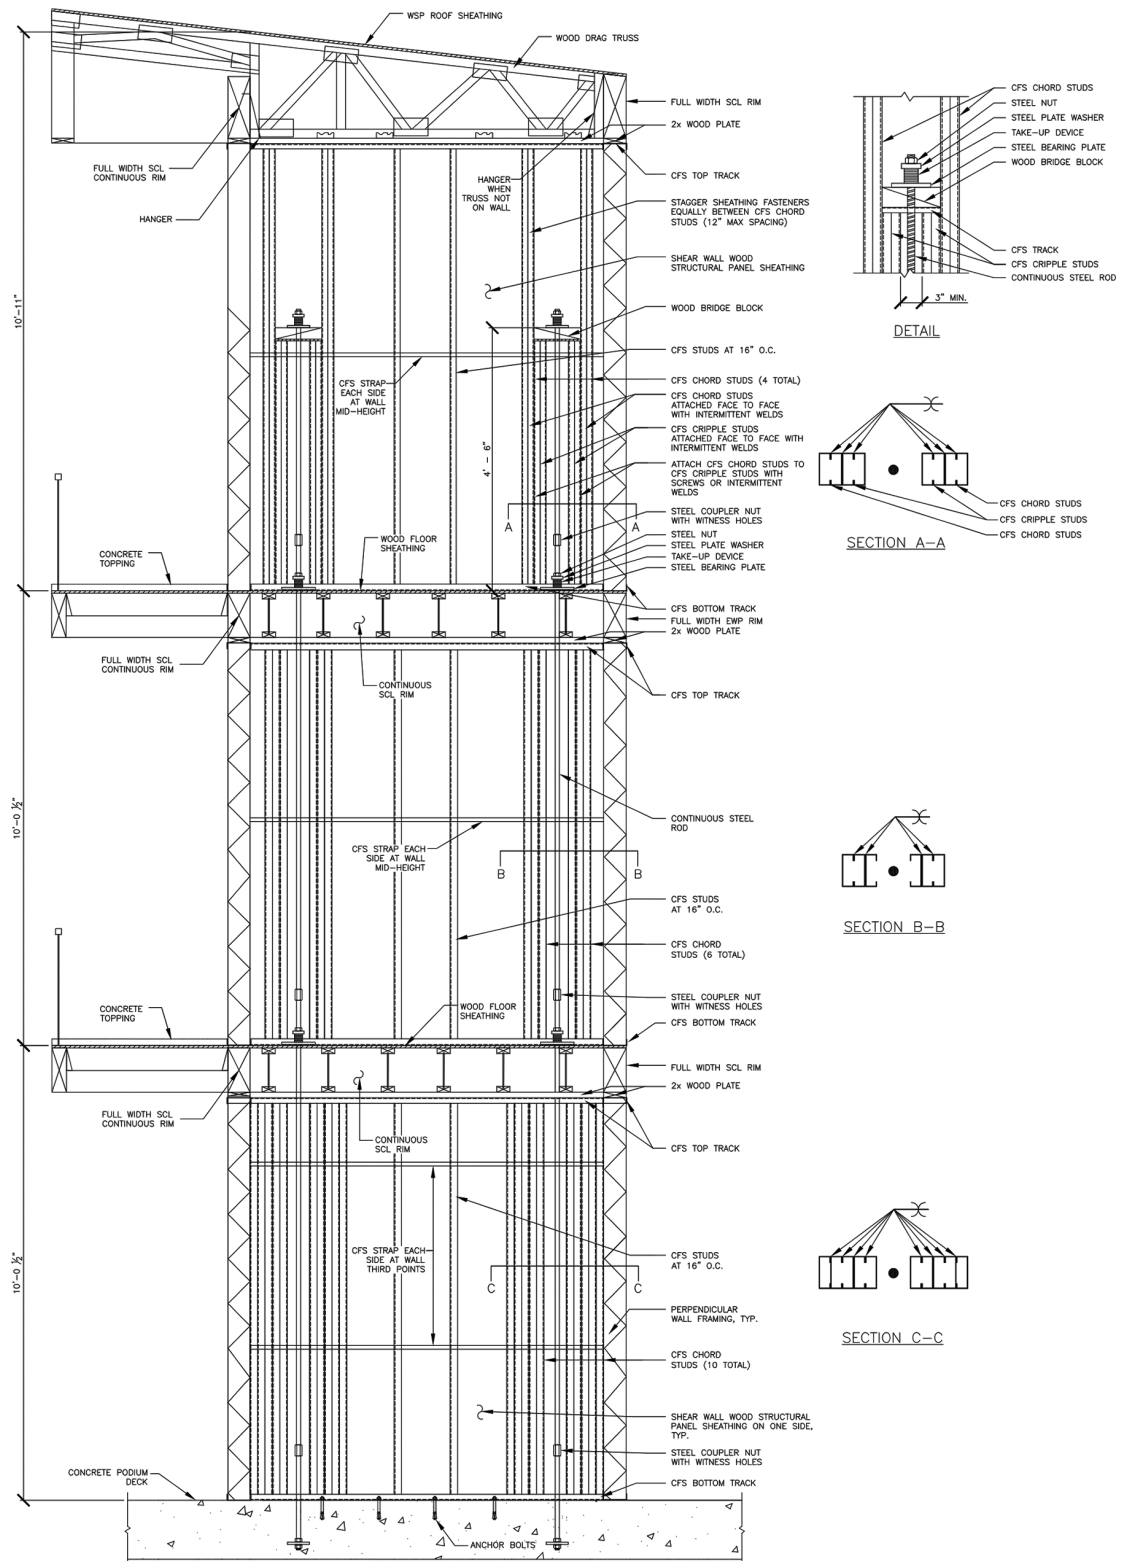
Shear wall elevation using mixed framing materials—cold-formed steel (CFS) light-frame shear wall and wood-frame floor and roof
